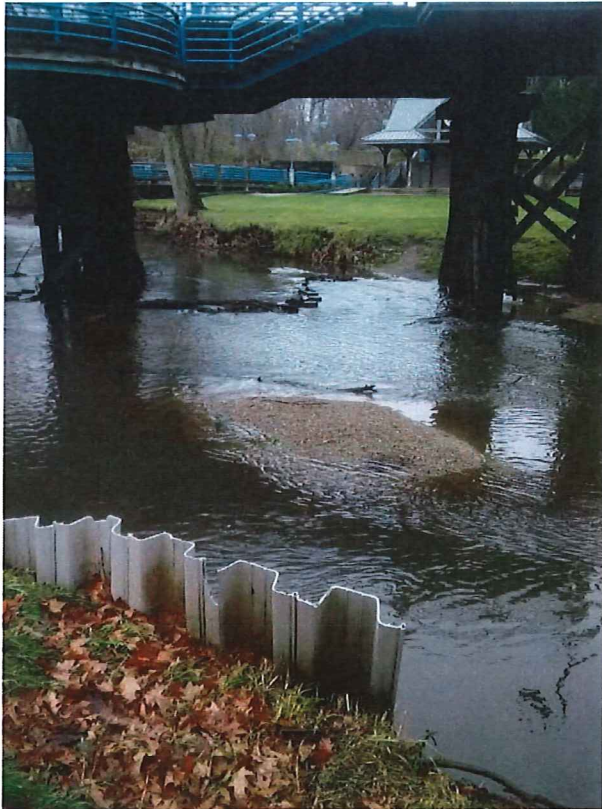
(Section 2 – south bank looking upstream): Shallow spot under bridge
